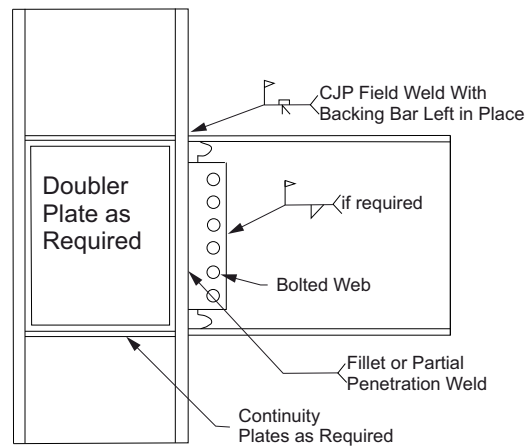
Example of a welded-flange-bolted-web (WUF-B) connection
